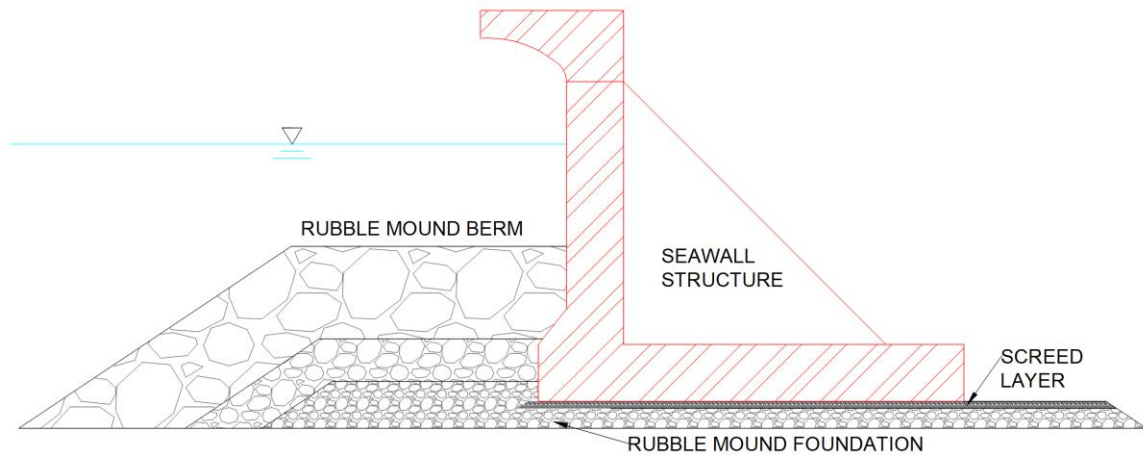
General design of cross-section of L-element on rubble-mound foundation with berm
